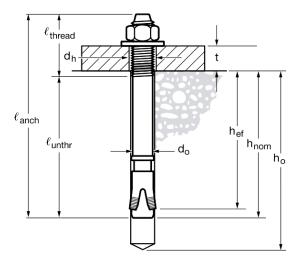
Guidelines for Anchoring Expansion Anchors into Concrete
